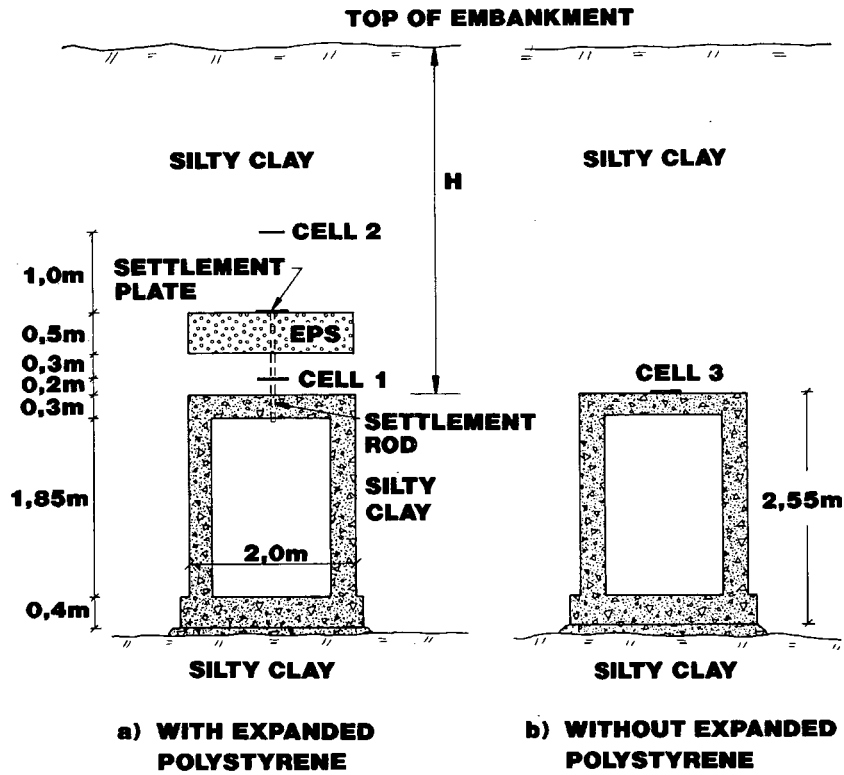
Geometry of instrumented cross section (Hallumsdalen).
